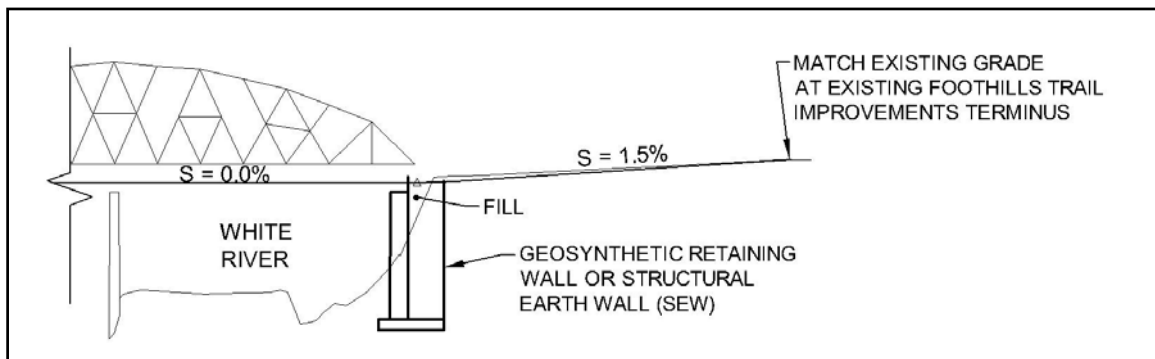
Southern White River Bridge Trail Approach – Fill Slope and Walls
